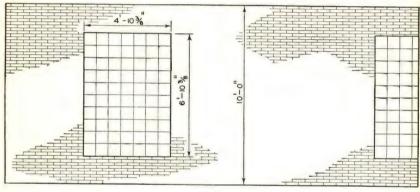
Pictorial View and Window Details of Twelve-Inch Brick and Tile Wall
